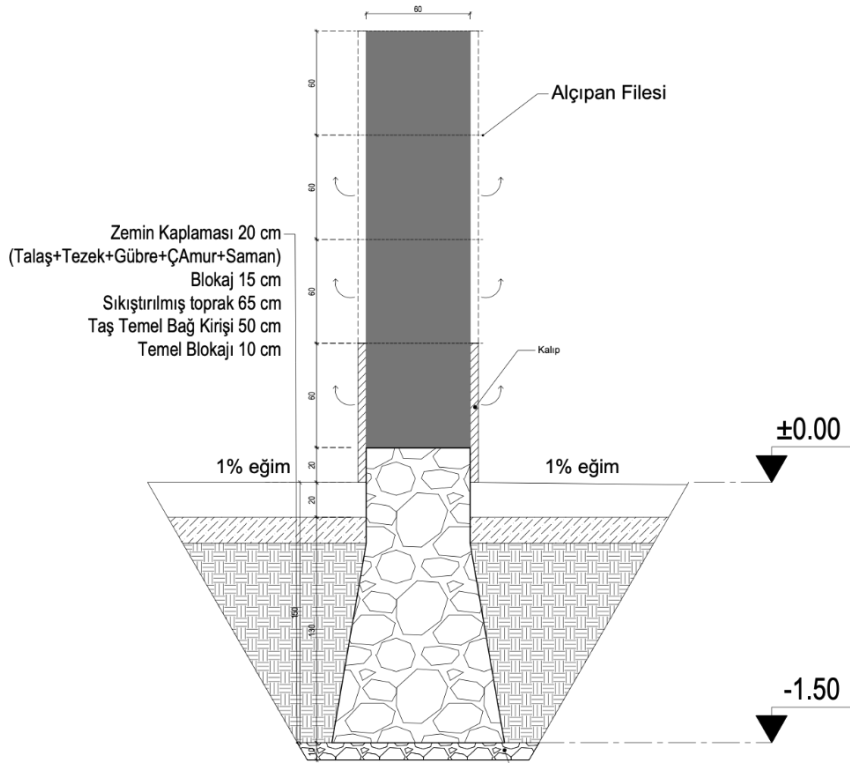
Principle section for rammed-earth wall and stone foundation, Dilara Demiralp, 2019
